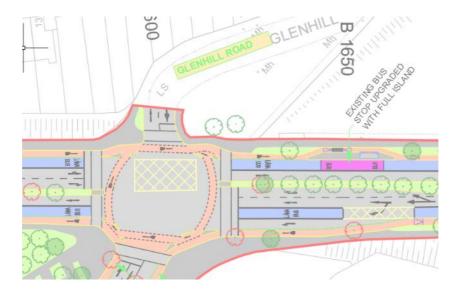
Junction Type 2 Proposed Glenhill Road Junction
